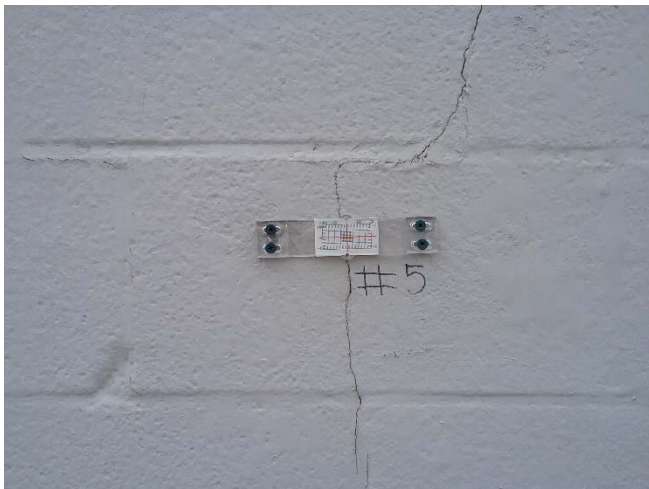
Crack gauge 5 position on a vertical crack on the north exterior wall.
